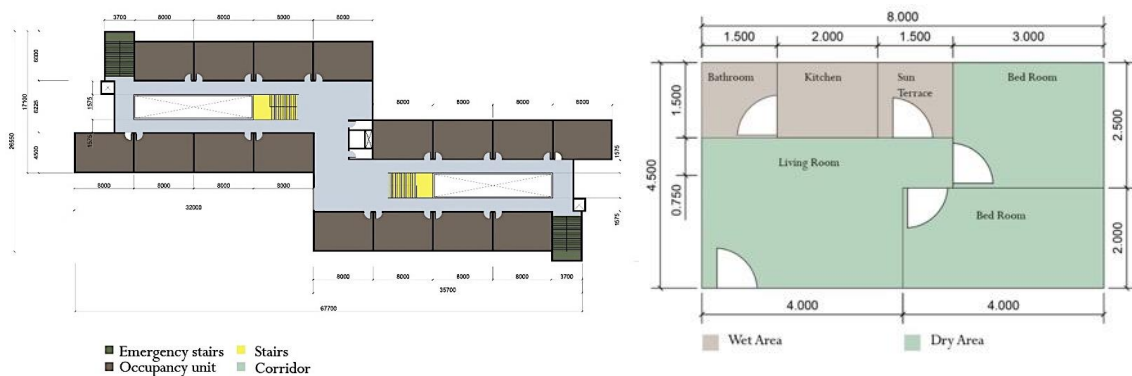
Typical floor plan (left) and unit plan (right) of Rusunawa Pesakih.
